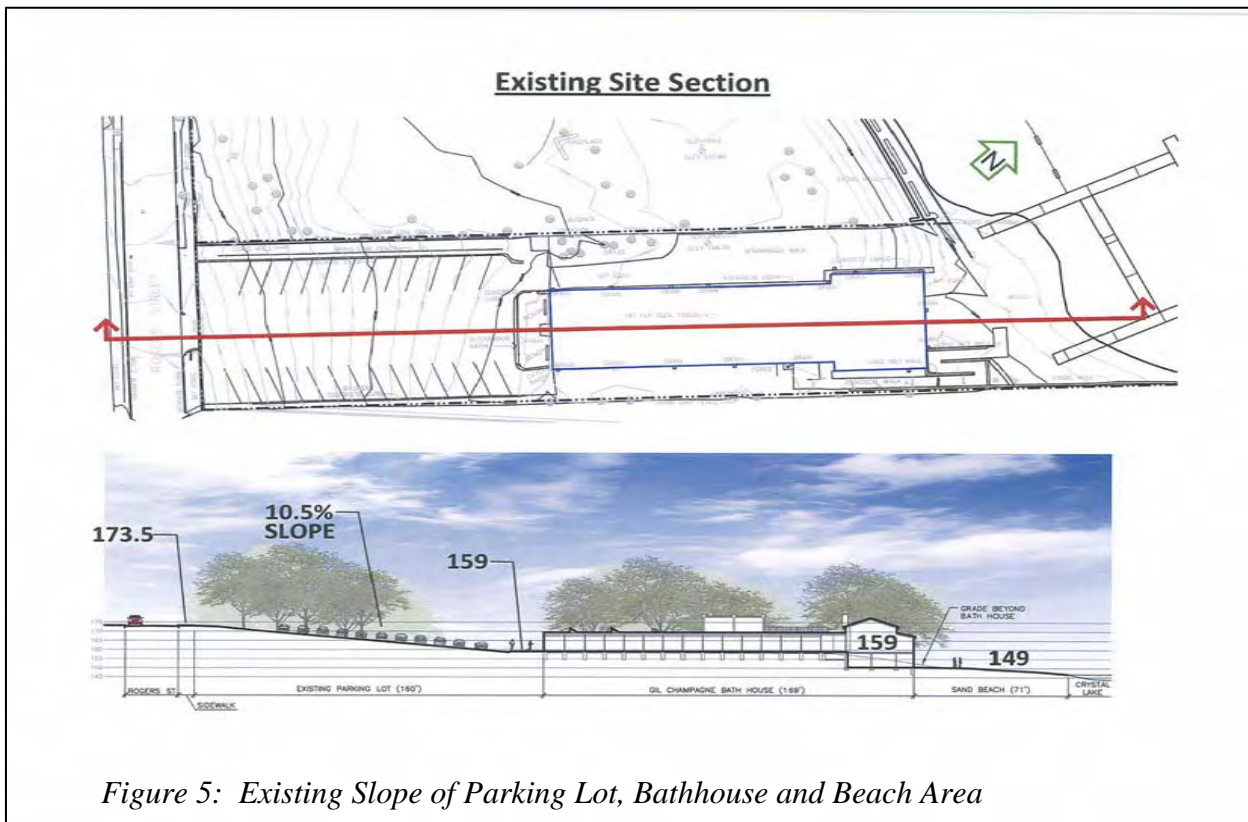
Existing Slope of Parking Lot, Bathhouse and Beach Area
